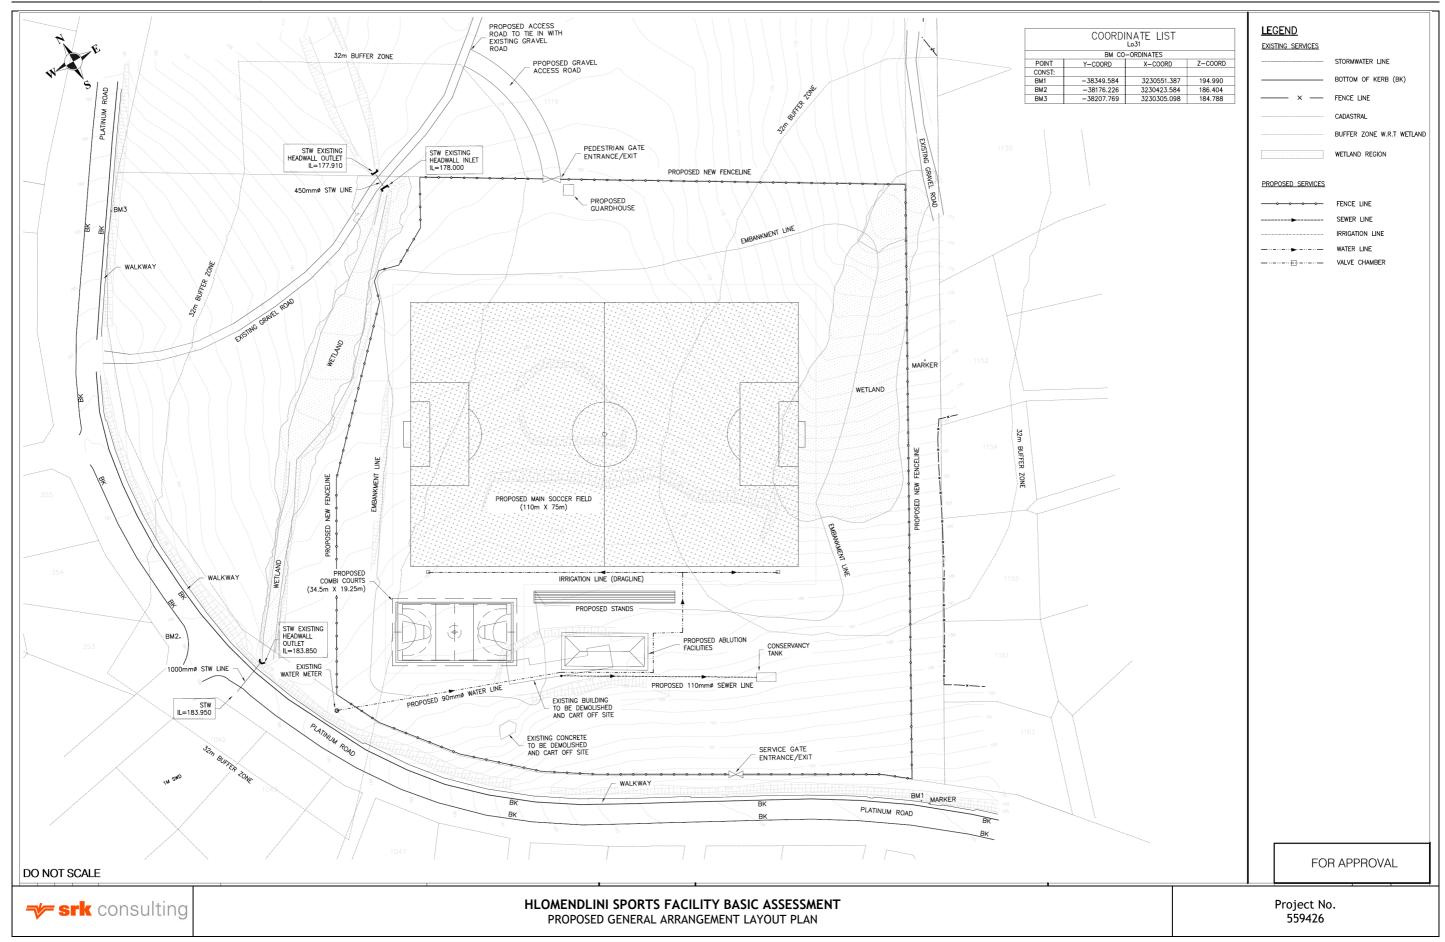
Proposed general arrangement layout plan for the preferred alternative
